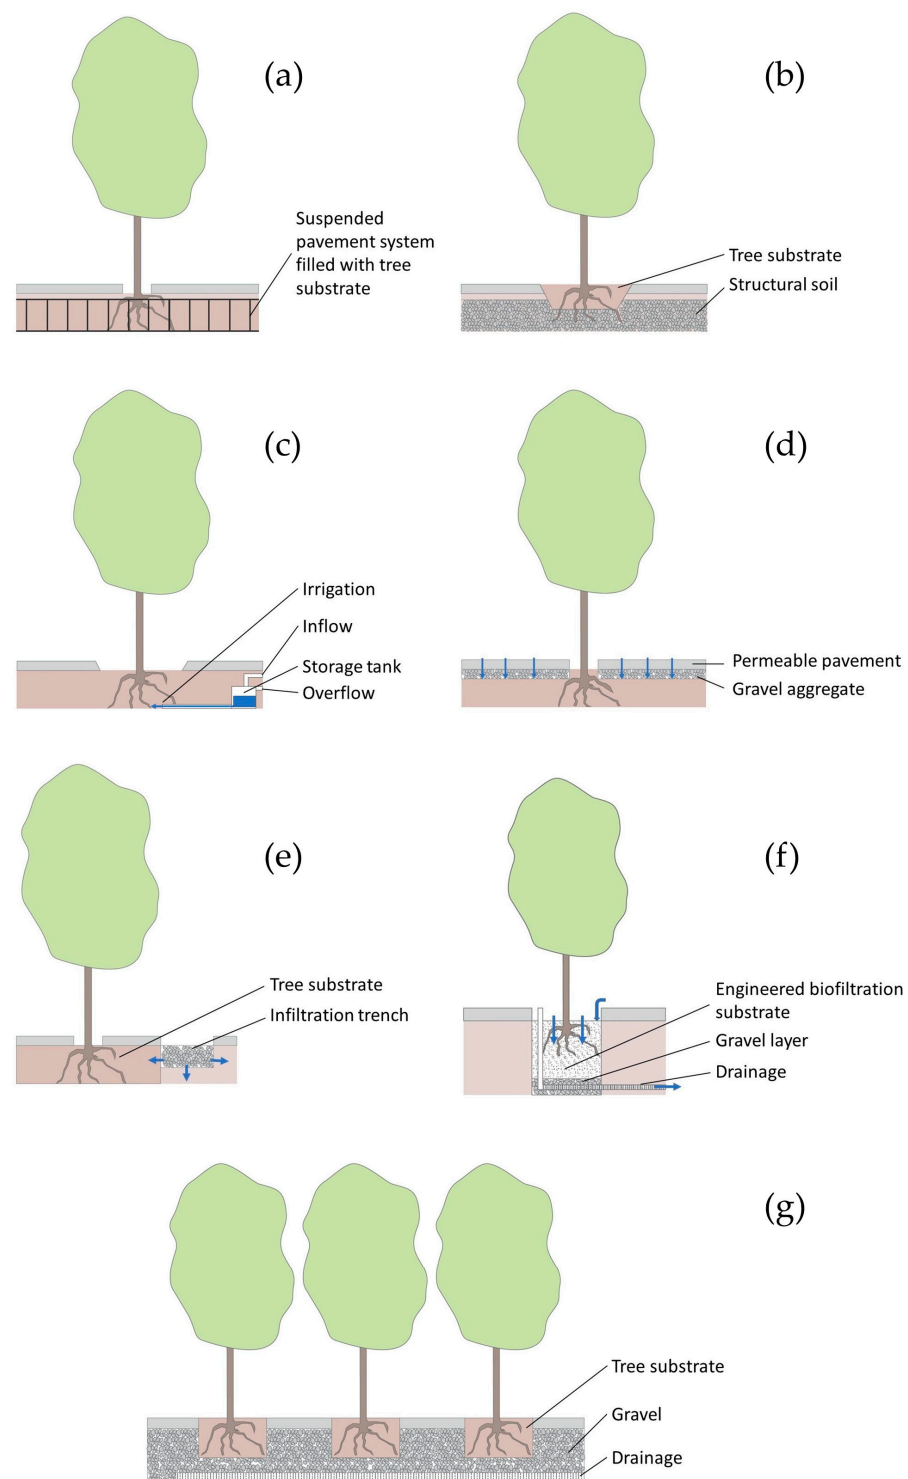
Sketch of principles and basic technical details of BGI tree systems: suspended pavement systems (a), structural soil systems (b), rainwater harvesting systems (c), permeable pavement systems (d), infiltration trenches (e), biofiltration systems (f) and tree trenches (g).
